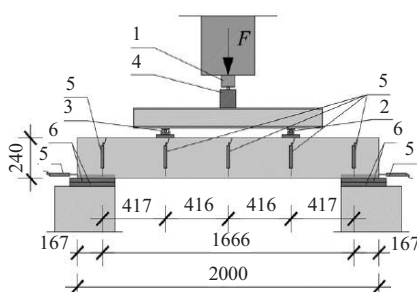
The scheme of test stand, where: 1 – hydraulic jack; 2, 3 – bearing; 4 – force gauge; 5 – LVDT transducer; 6 – steel sheet
